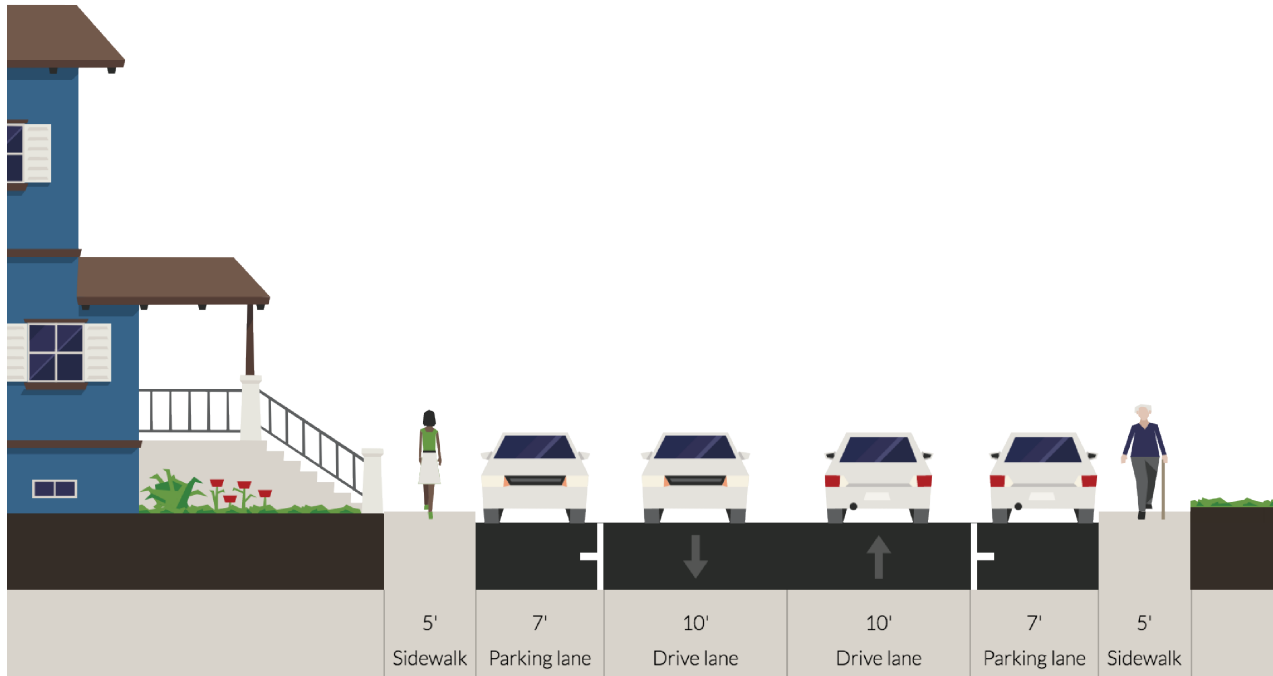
Local Streets, Typical Cross Section for 44-foot Right-of-Way
